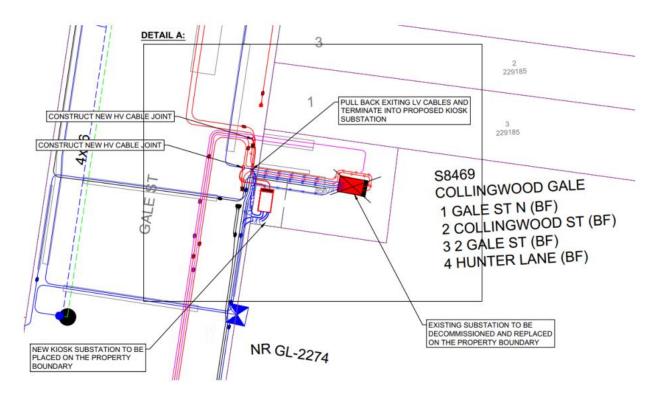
Extract of Proposed Works Plan (Source: SJB (AA Power Engineering))
